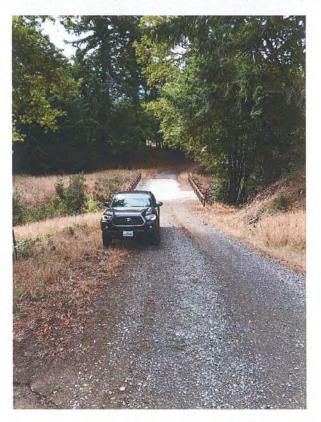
RP 11. Two-Lane Bridge. Vehicle traveling east, photo taken facing west.
